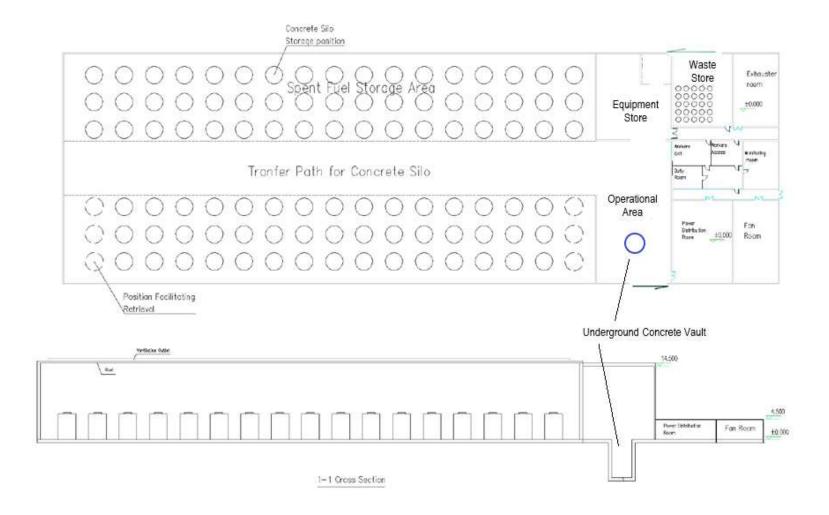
Preliminary SFIS Facility Layout for the First Phase
